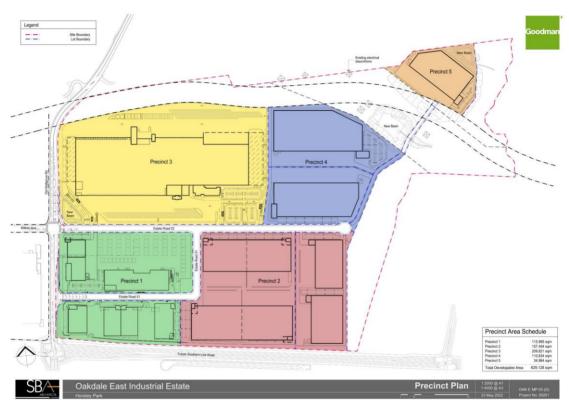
Precinct Plan for OEE (Source: SBA Architects)
